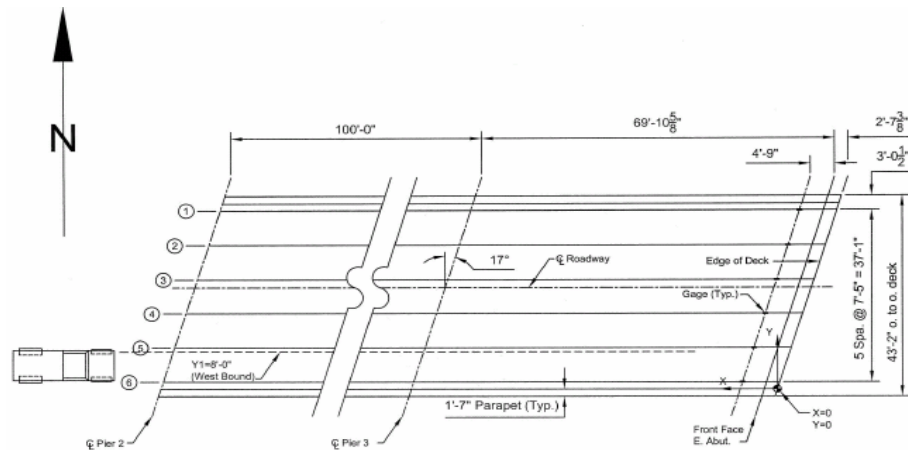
Bridge No 060-0319 plan (Cross et al., 2006)
